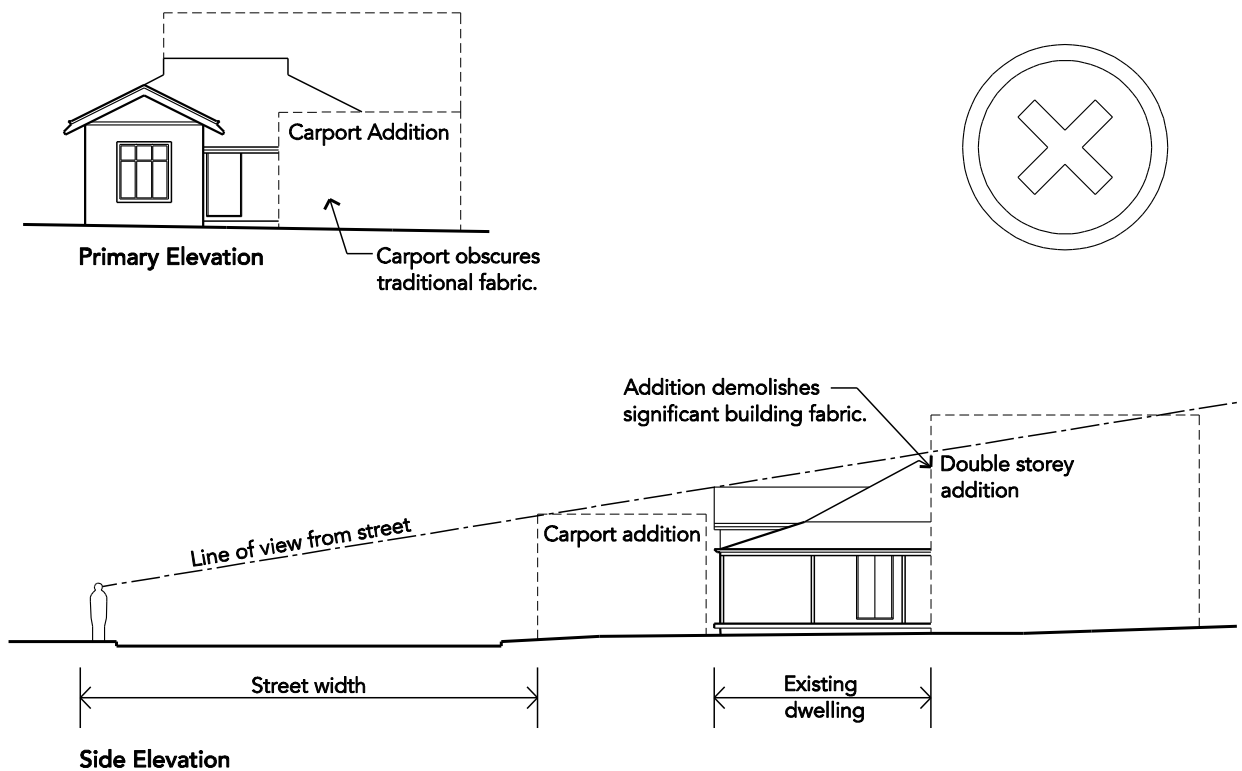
Elevations illustrating incompatible alterations and additions – *Griffiths Architects 2012.
